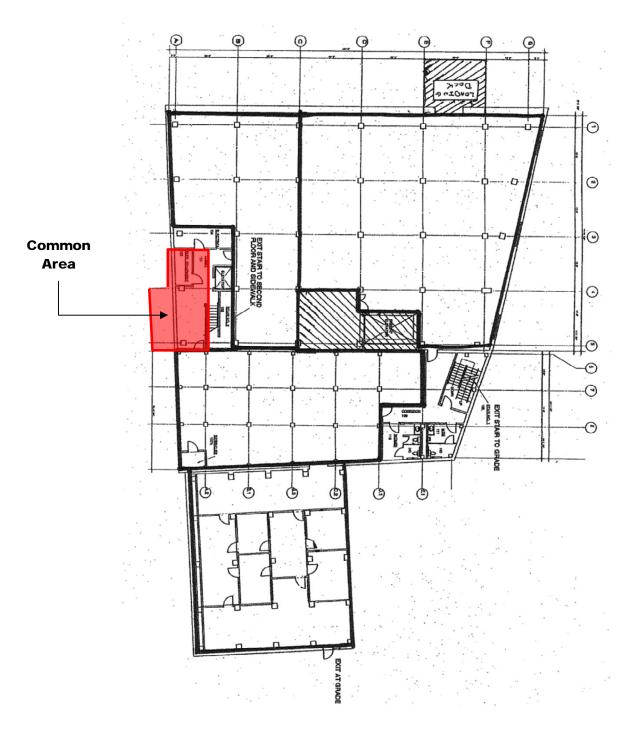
Exhibit B COMMON AREAS AND BUILDING EXTERIOR AREAS
